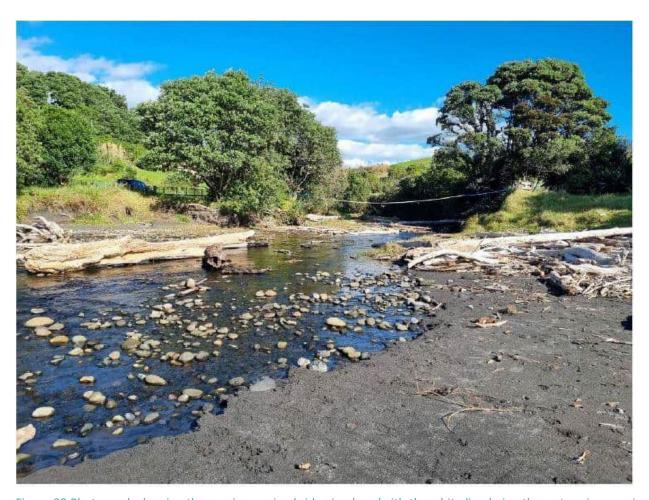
Photograph showing the previous swing bridge in place (with the white line being the water pipe running under the platform of the bridge).
